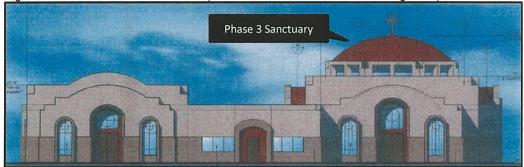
Phases 2 & 3 Elevations (View from Project Site looking east)
